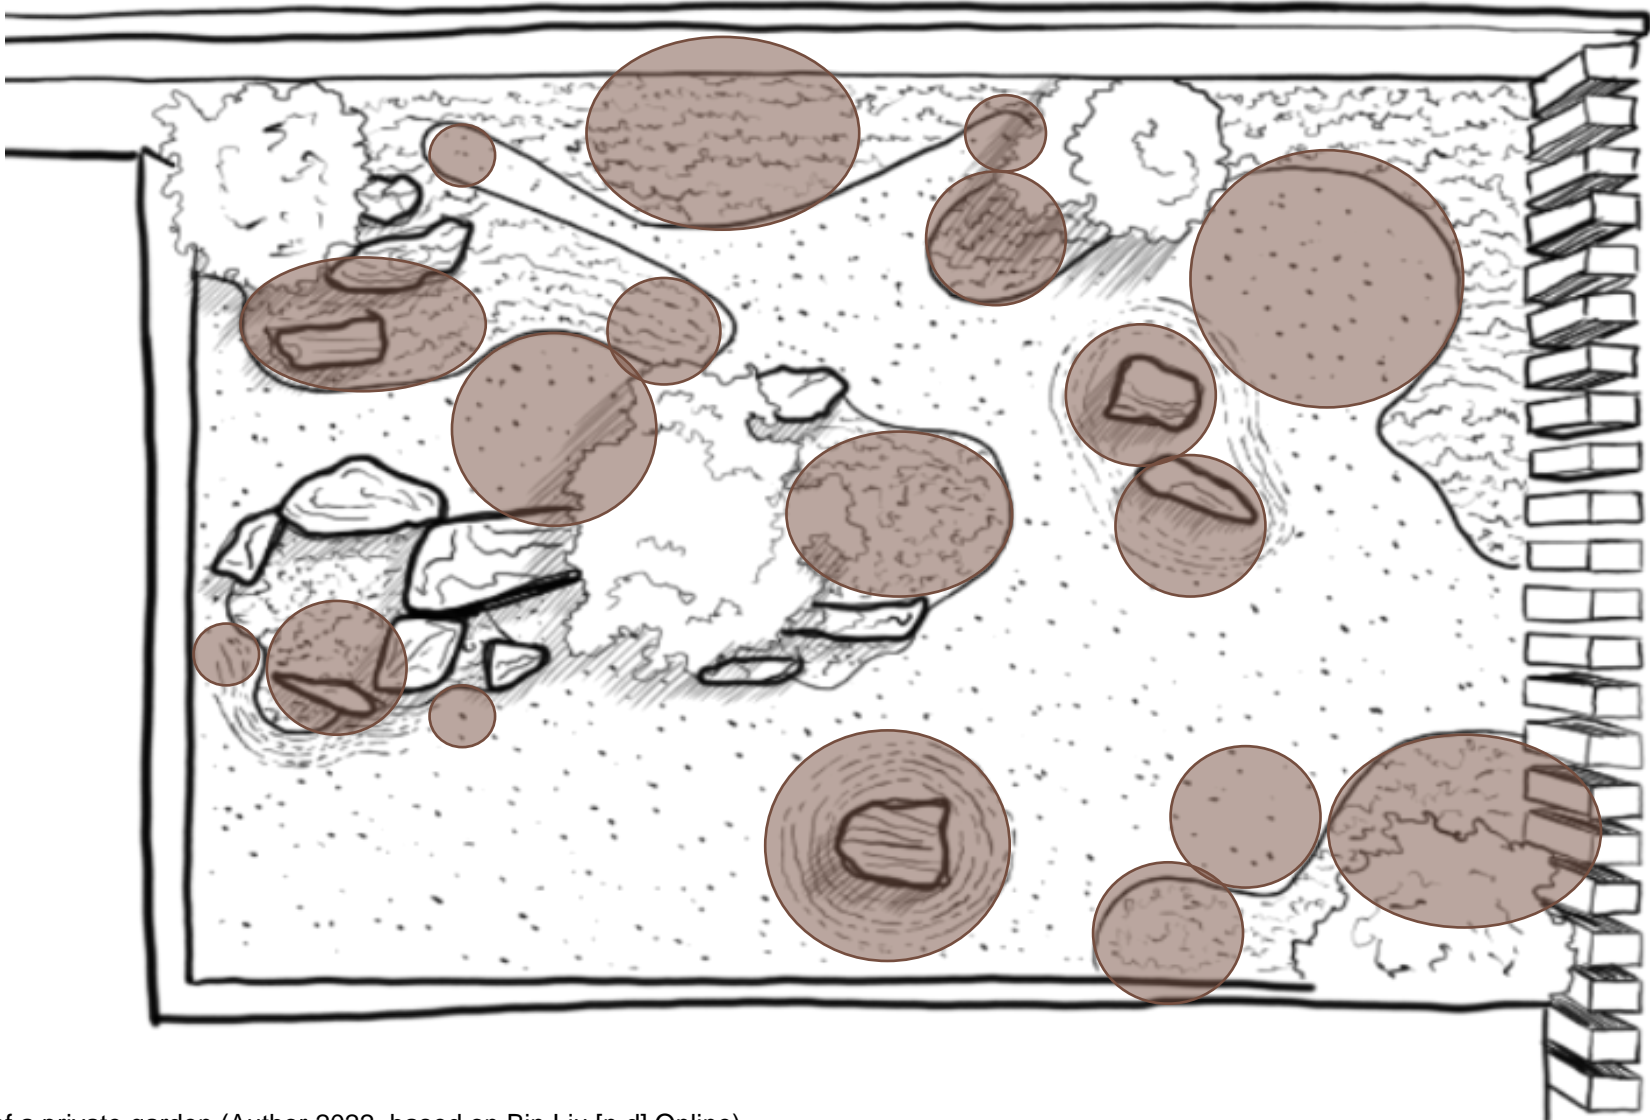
Plan drawing of a private garden (Author 2022, based on Bin Liu [n.d] Online).
